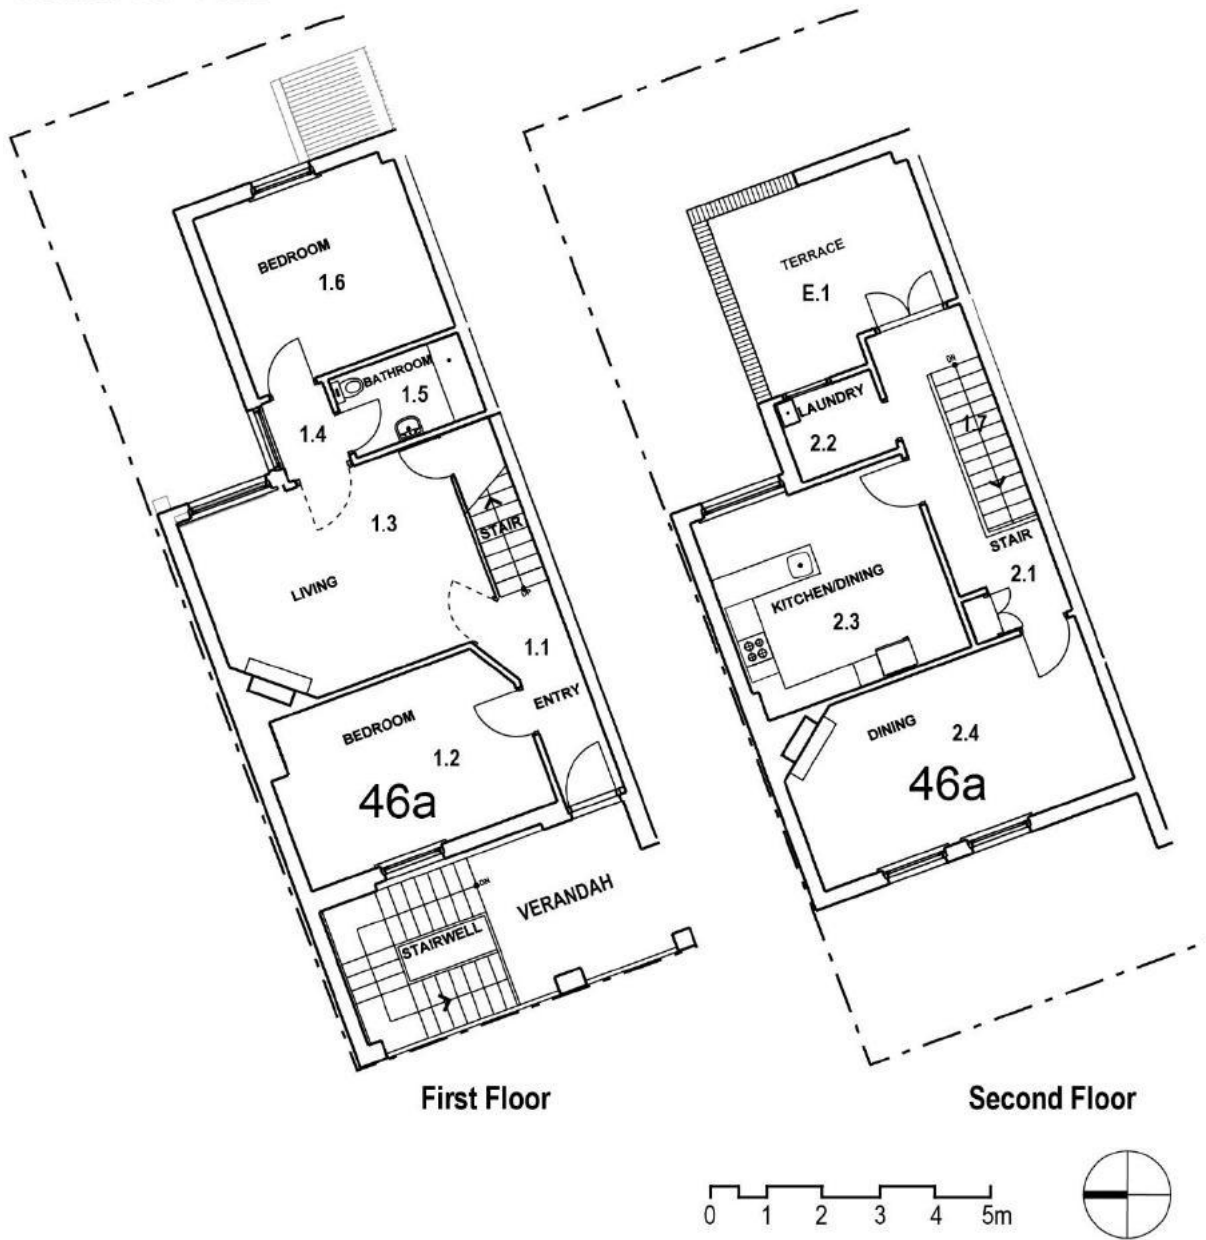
Floor plans of Flat 46A / 46-56 Gloucester Street showing layout of flat and space numbers, for the first and second floors. (Source: LAHC, with GML overlay 2016)
